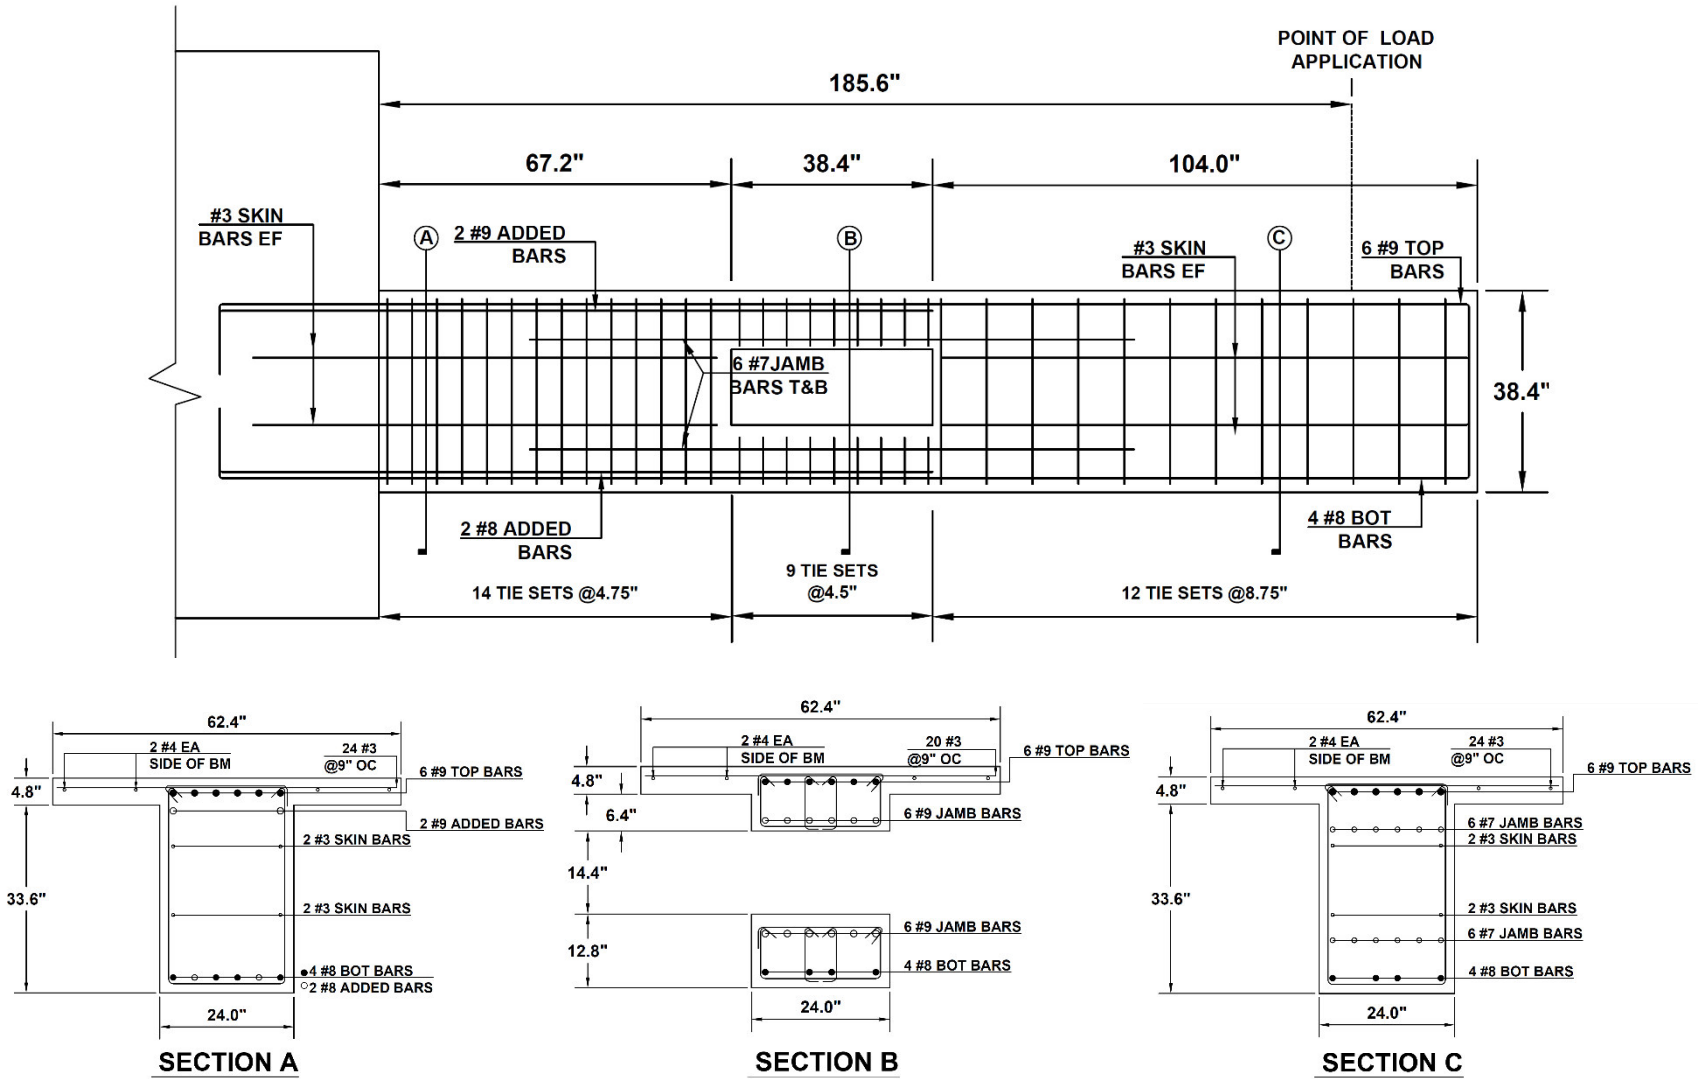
Beam elevation geometry and reinforcement details for S3
